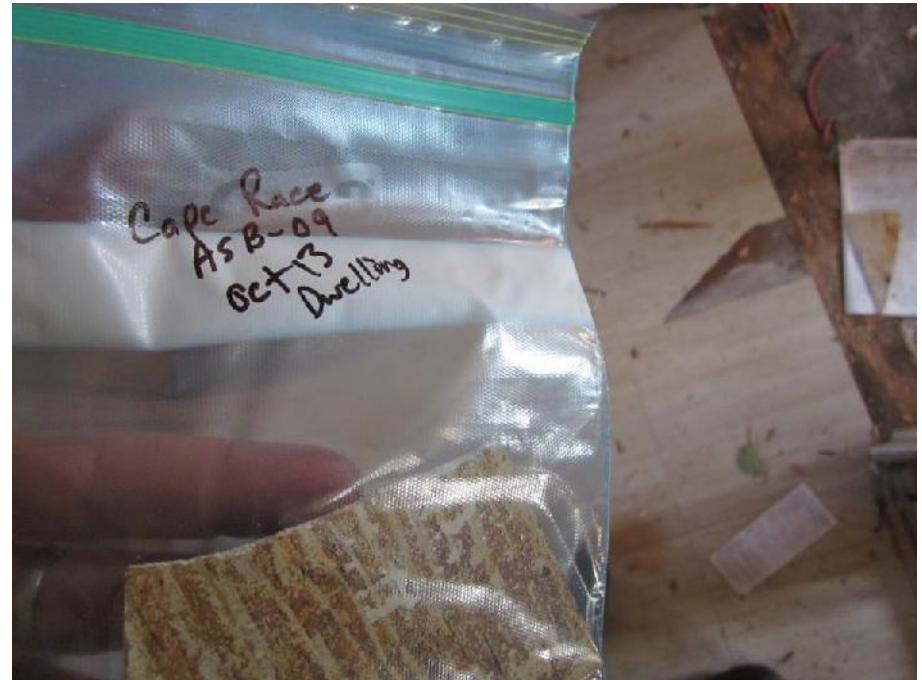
View of location of vinyl floor tile/mastic sample ASB-09 (Room 4).
